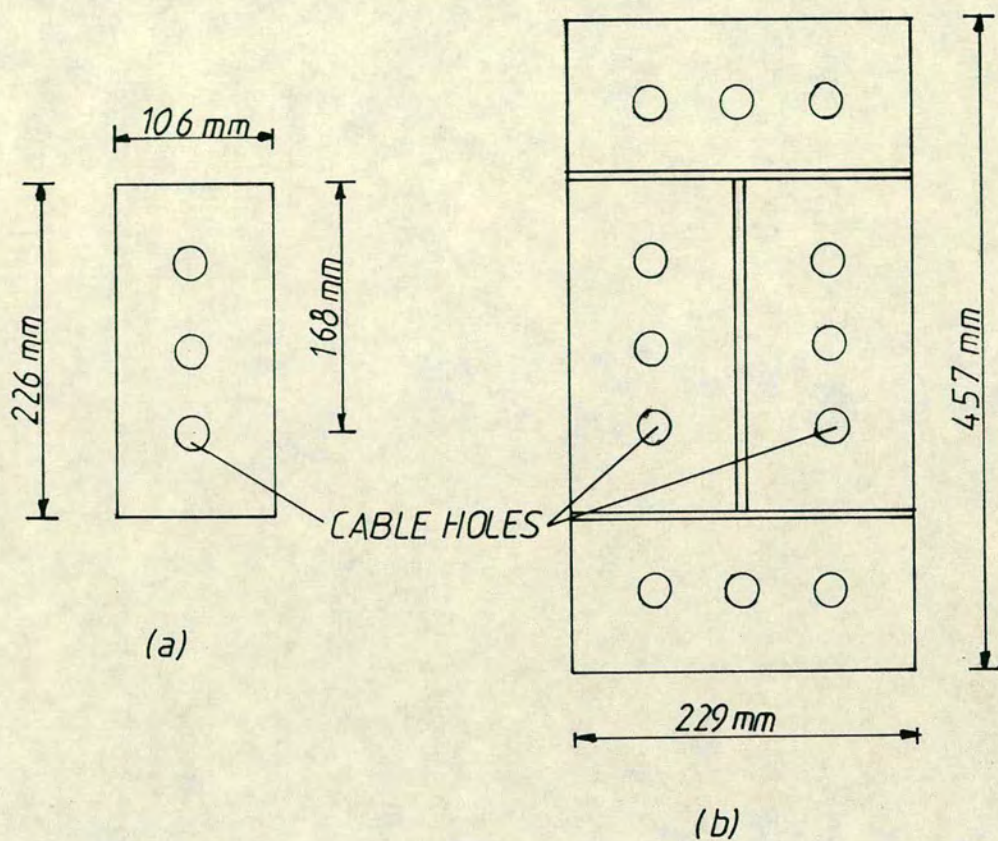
Beam Section of K. THOMAS⁽³⁾
